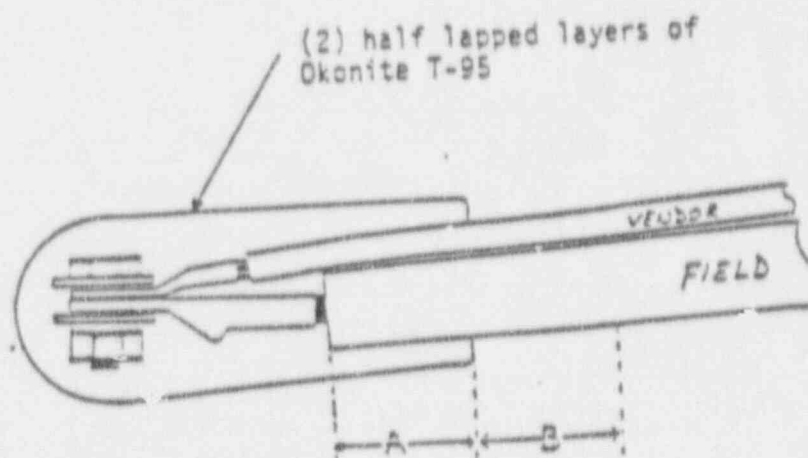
Specimens 10.1A, 10.1B, 10.2, 10.3
